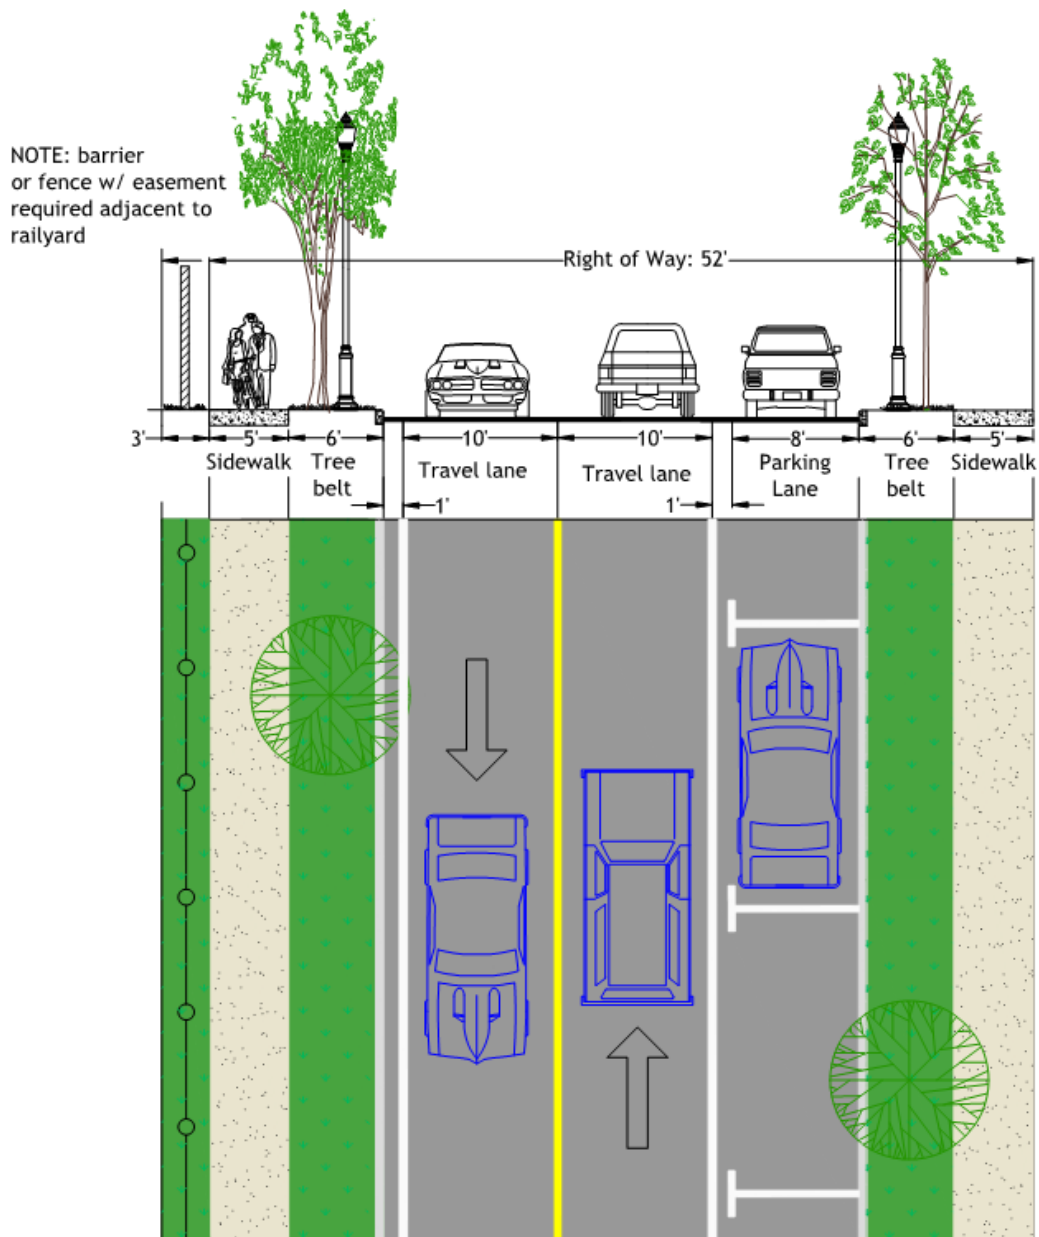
shows two illustrative right-of-way cross-sections for Slow Streets. An optional barrier is shown for implementation when street is adjacent to the railyard.
